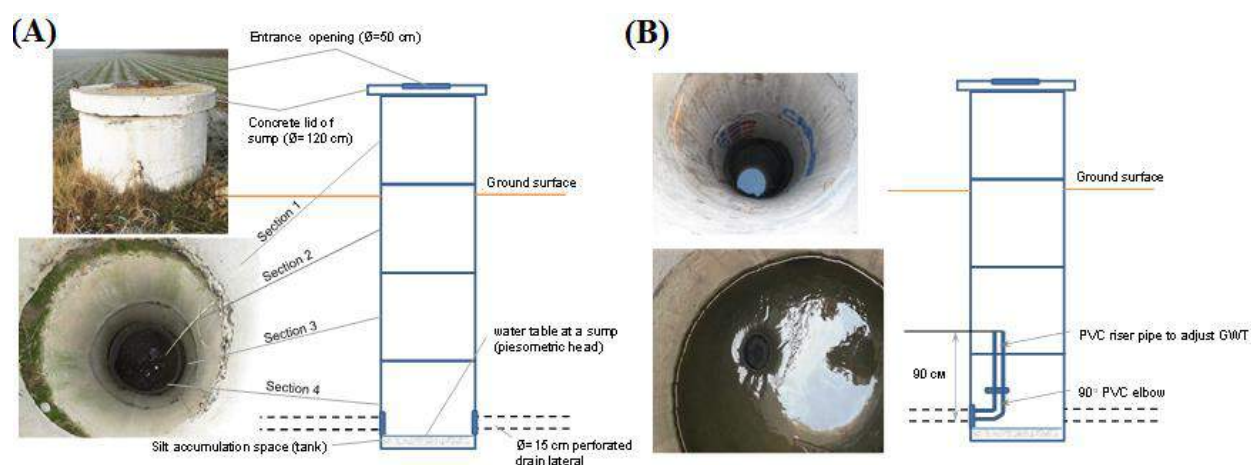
Cross-section of inspection sump (A) and raised water table after installation of pipe riser on lateral drain (B)
